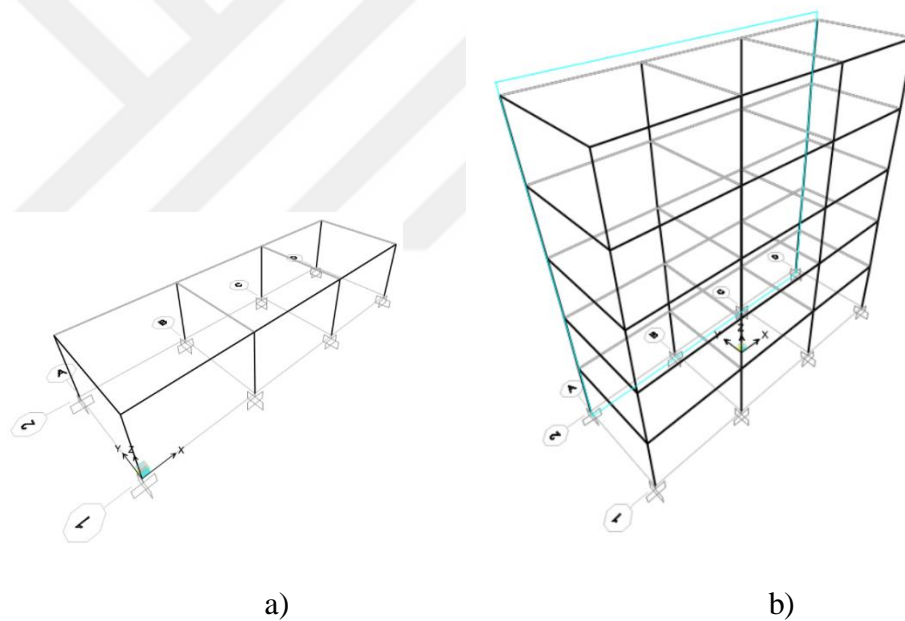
The Sap2000 Model of a) Low-rise building b) Mid-Rise building
